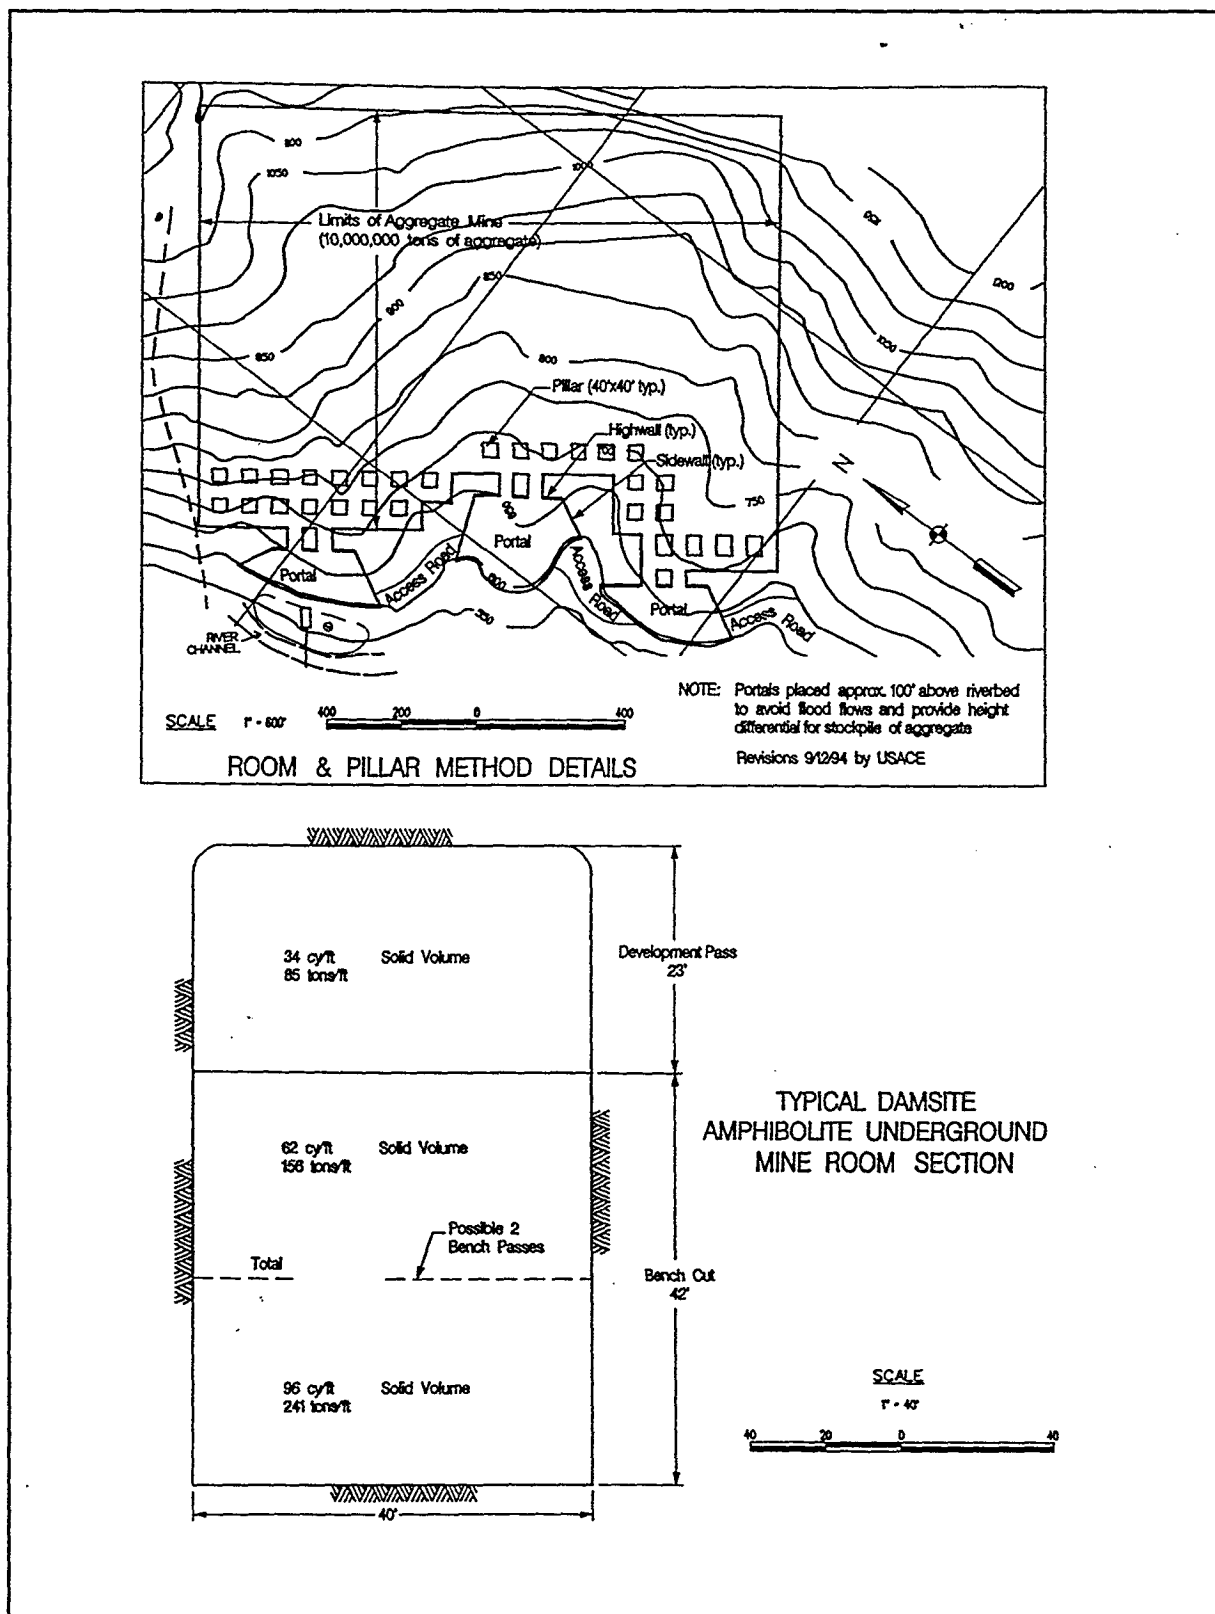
Typical Damsite Amphibolite Underground Mine Room Section.
